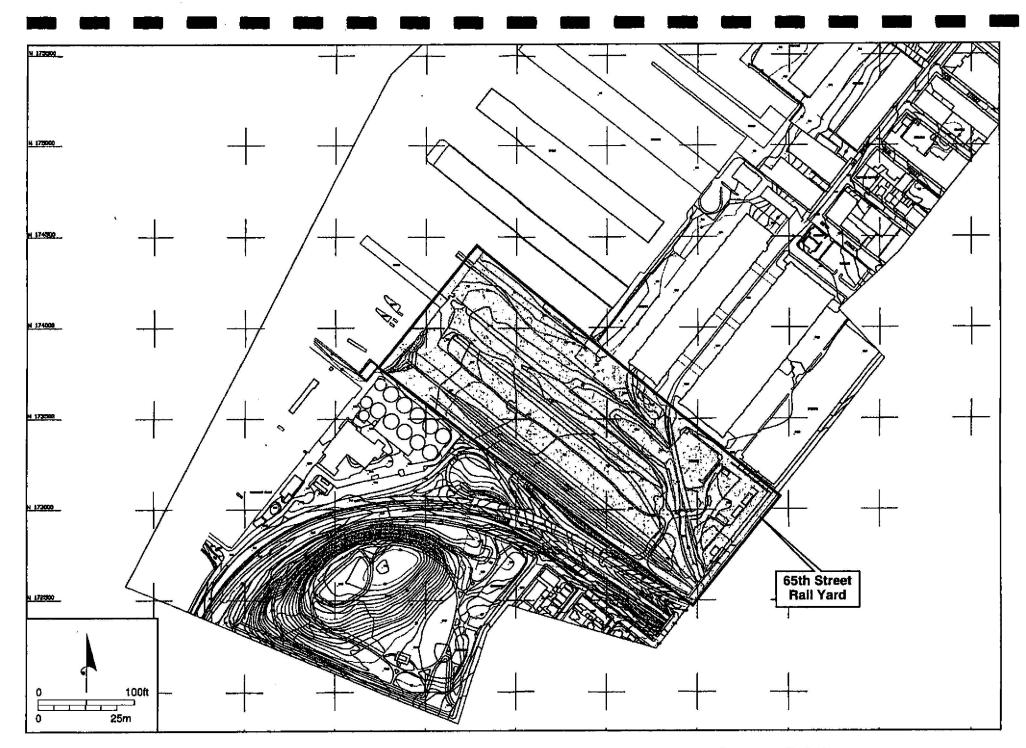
Project plans showing existing topography and landscape engineering at the 65th Street Rail Yard.
